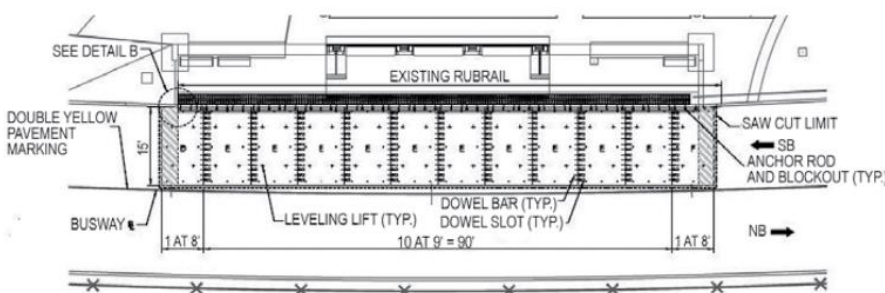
Panel layout for one of the bus pads at the East Main Street Station, New Britain, CT
